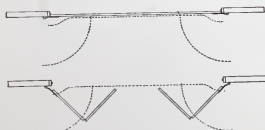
Floor plans showing operation of four doors equipped with "Slidetite" No. 1235 hardware, illustrating (1) doors open at right angles with front wall, (2) doors open parallel with front wall. The dotted lines represent the tracks.
